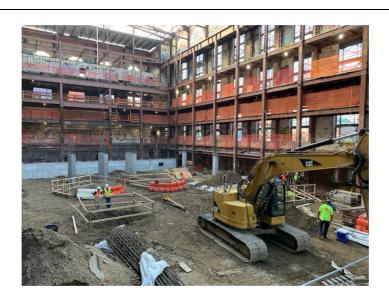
Facing west, Donato Plumbing Inc. continues installation of plumbing utilities at the boiler house superstructure.
